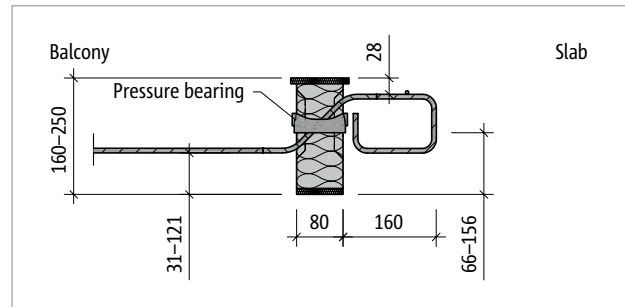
Schöck Isokorb® T type Q-E-W-V4: Product section
